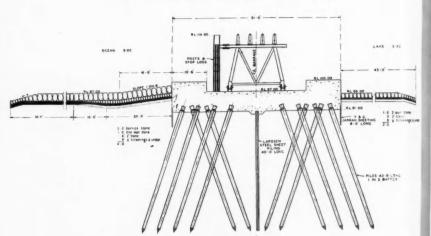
Goolwa Barrage: Section through Navigable Pass.
